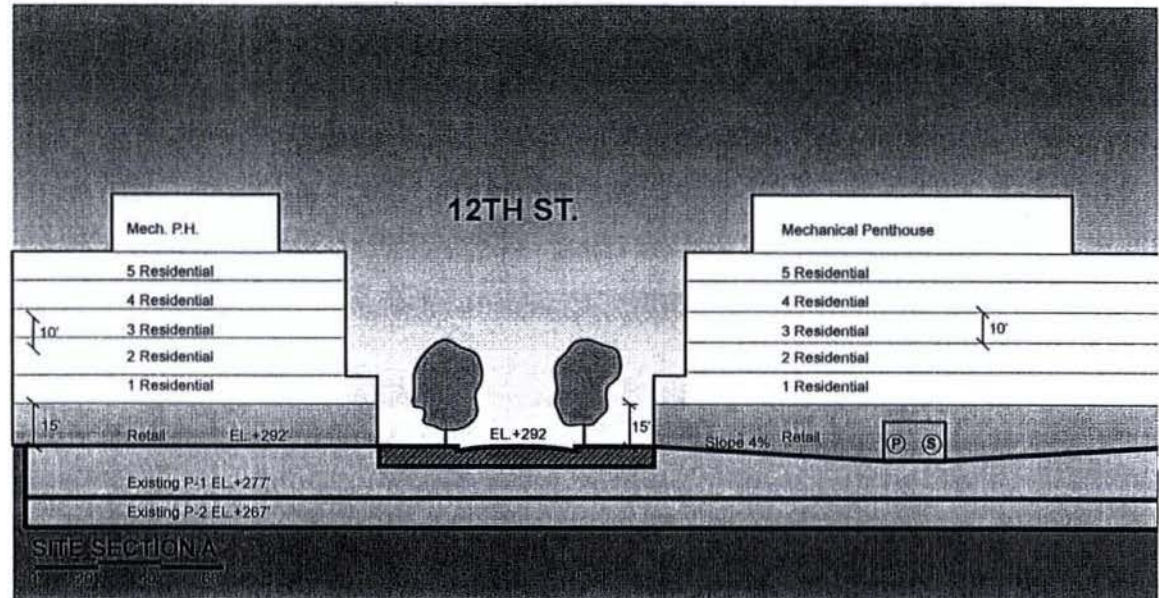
Town Center Site Section. Source: Perkins+Will.
